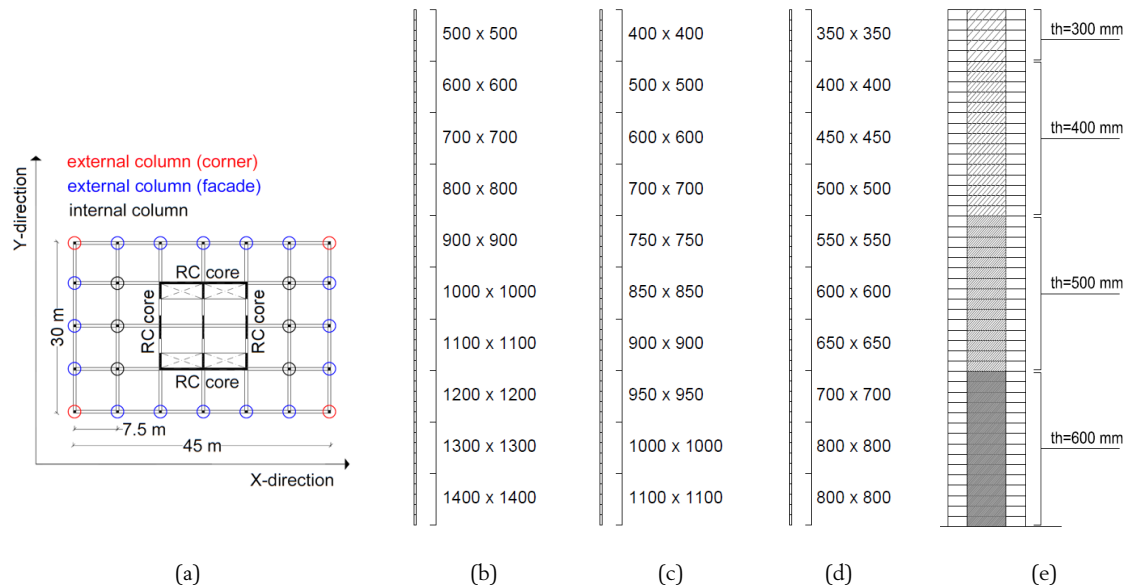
Schematic structural design of the case study in a 50-storey building. (a) Schematic plan view with the concept design of the structure. (b) Internal column size, (c) external column (façade) size, (d) external column (corner) size, (e) central core wall thickness.
